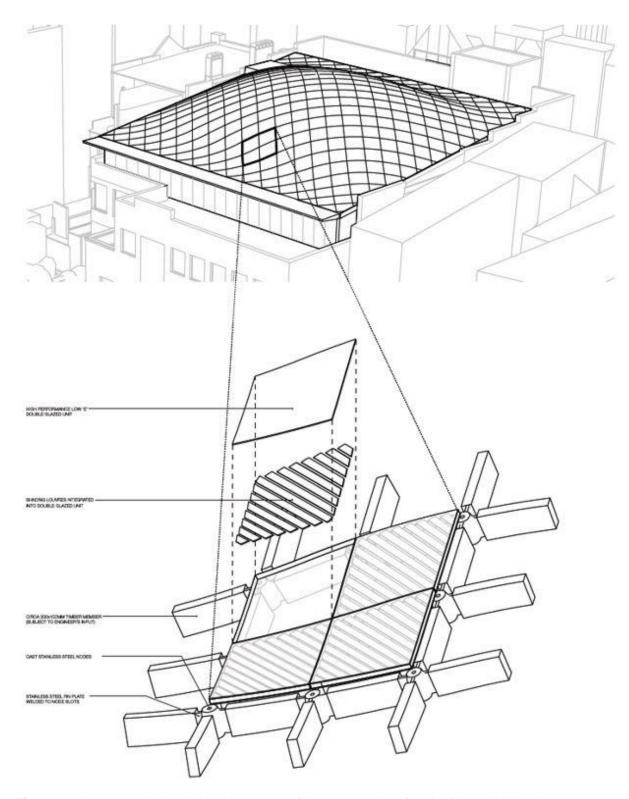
Axonometric detail drawing extract of the proposed roof to the Piccadilly Hotel
